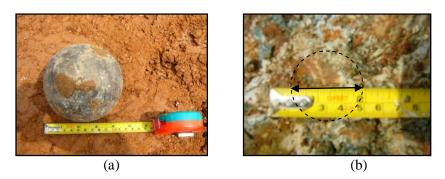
(a) Standard ball for impact load test (b) diameter of dented surface
